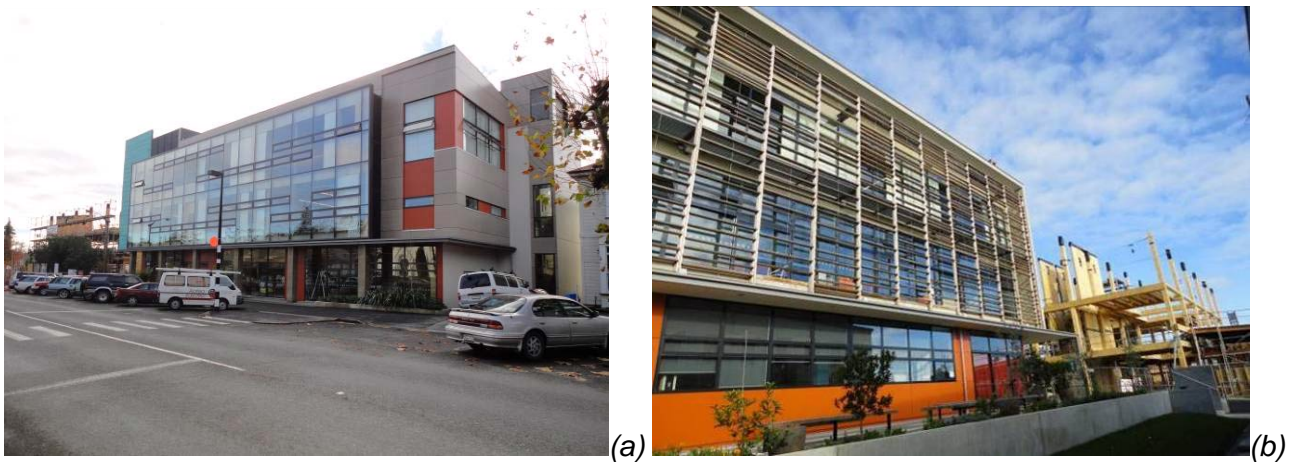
(a) south façade of T-Block with the Arts building under construction to the left, and (b) the corresponding north façades.
